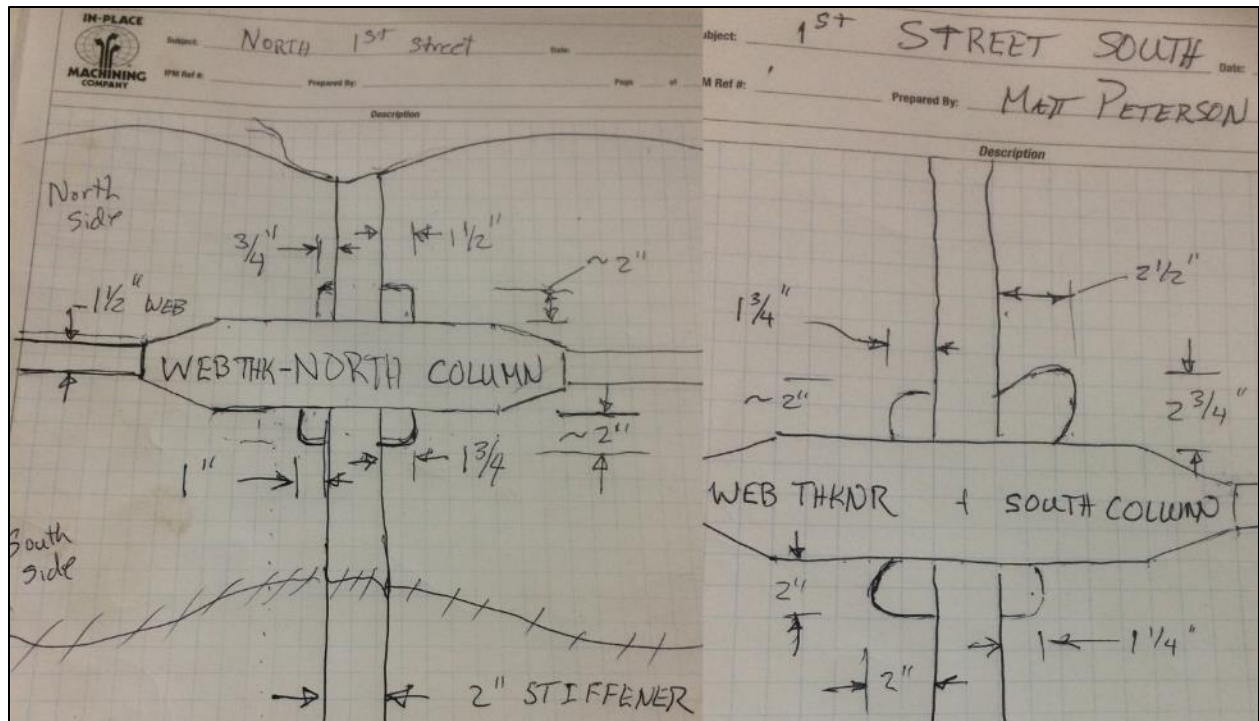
First Street weld access hole dimensions, measured by In-Place Machining on October 28, 2018.
